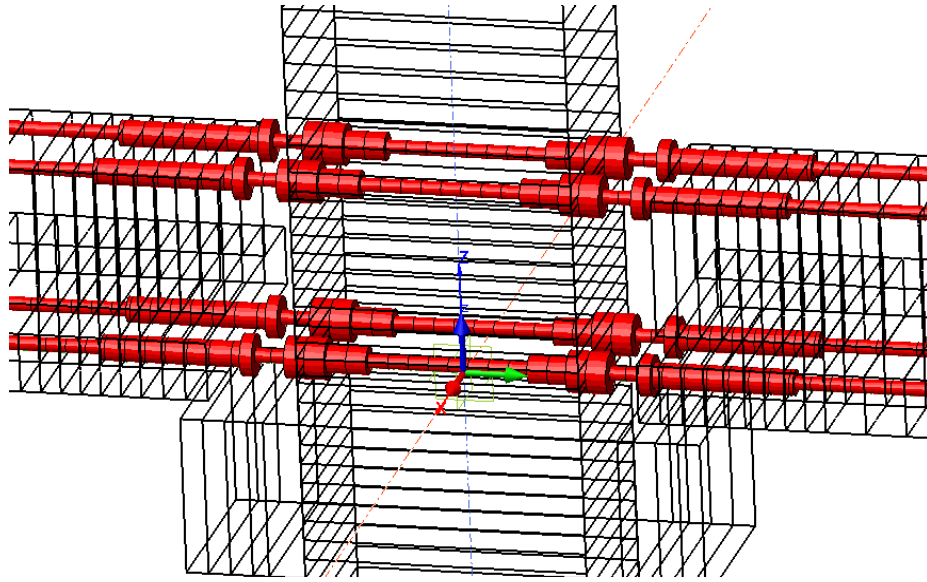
Reinforcing steel of 3D modeling: zoom at the section of innovative solution for ductile connection.
